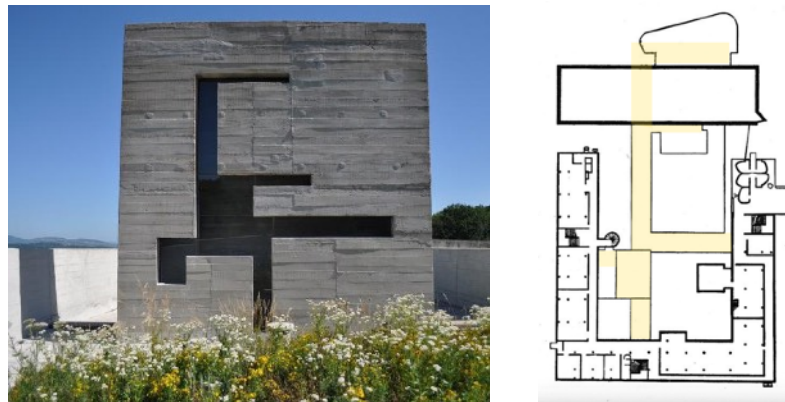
Path of light. Left image: The “path of light” on the rooftop stairwell bulkhead on the terrace (Escalier toit-terrasse, vue générale © Famille I Xenakis DR). Right image: Light path abstract diagram on the floor plan of La Tourette (Plan from wikiarquitectura, diagram by author).
